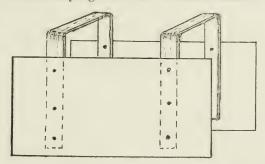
Steel shield used to hold back quicksand. Should be 28 inches long and 12 inches or more high.
